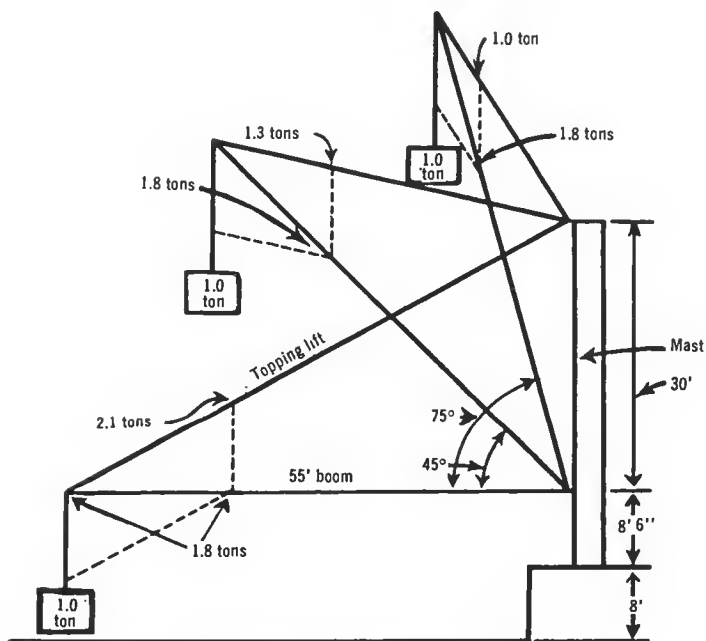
B.—Elevation, 55-foot boom on 30-foot mast.
